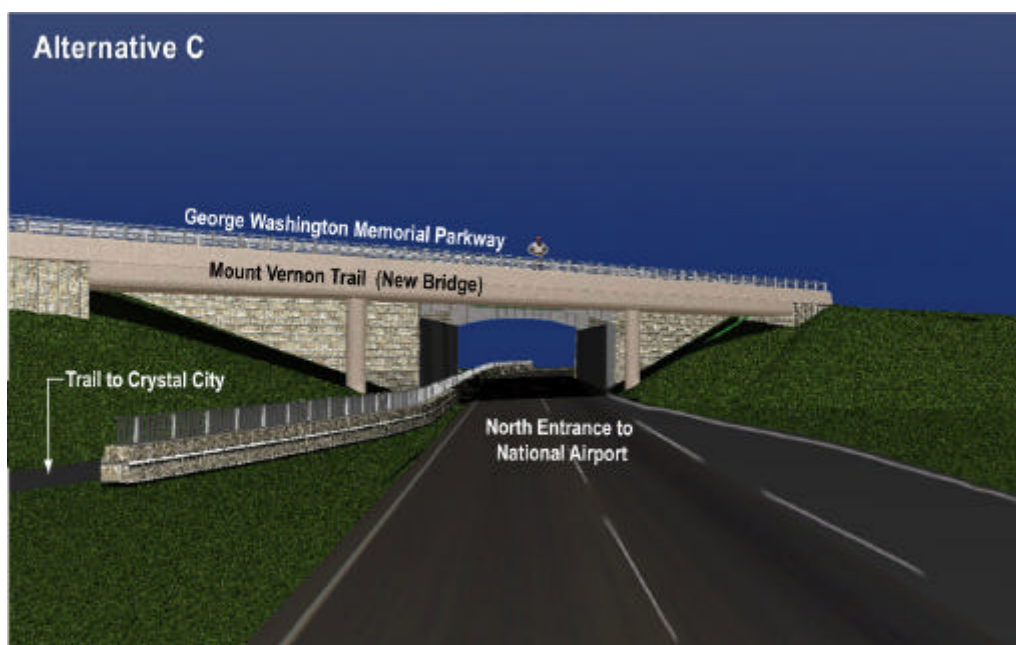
Side view of new trail bridge to support the realigned trail (Alternative C)
